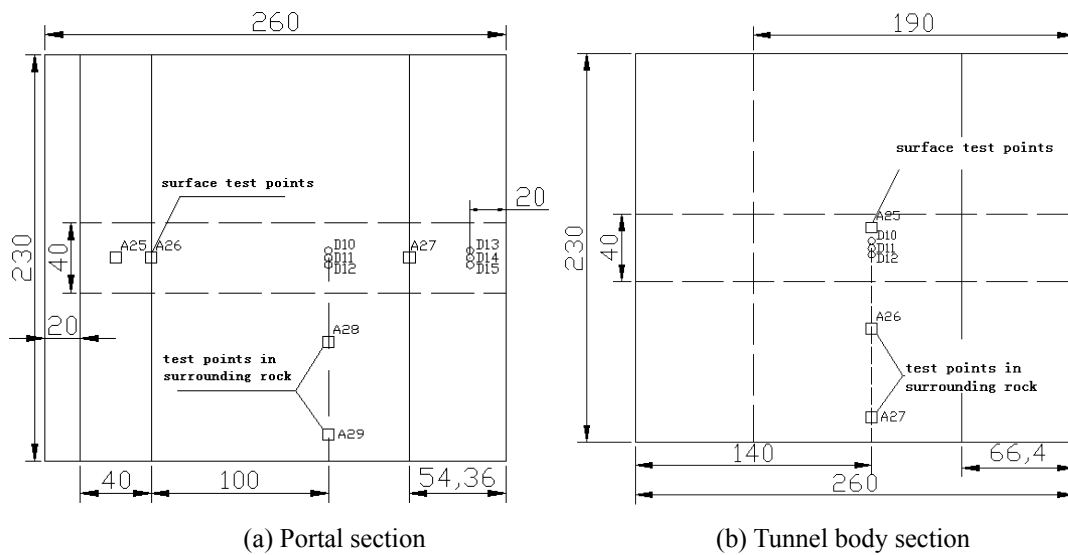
Top view of the arrangement of test points in tunnel and surrounding rock
